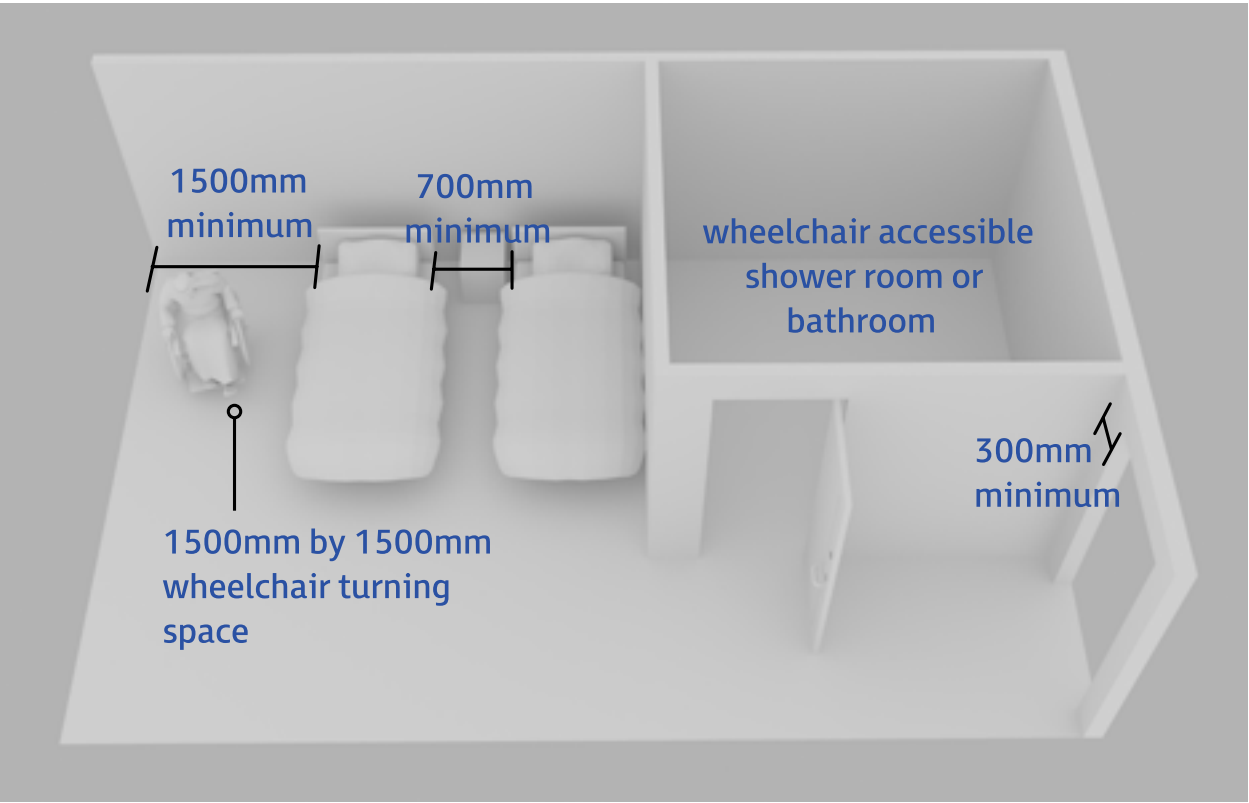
/ example of a wheelchair-accessible hotel bedroom with ensuite facilities
